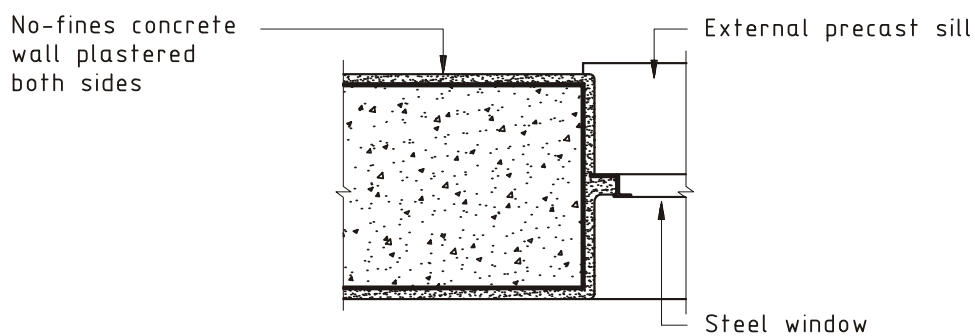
Typical waterproofing details at window openings in no-fines concrete wall with precast sill and lintel
